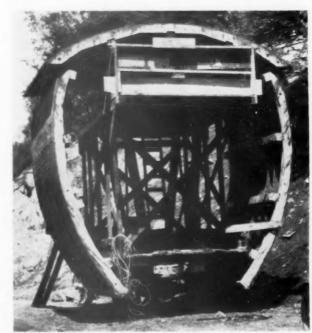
COLLAPSIBLE STEEL FORM USED IN LINING THE BIG OAK FLAT TUNNEL.
